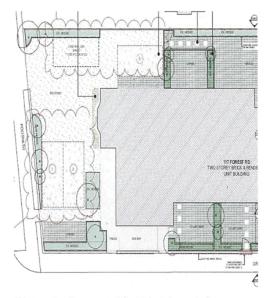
Proposed front landscaped area Source: Landscape Plan BKA Architecture
